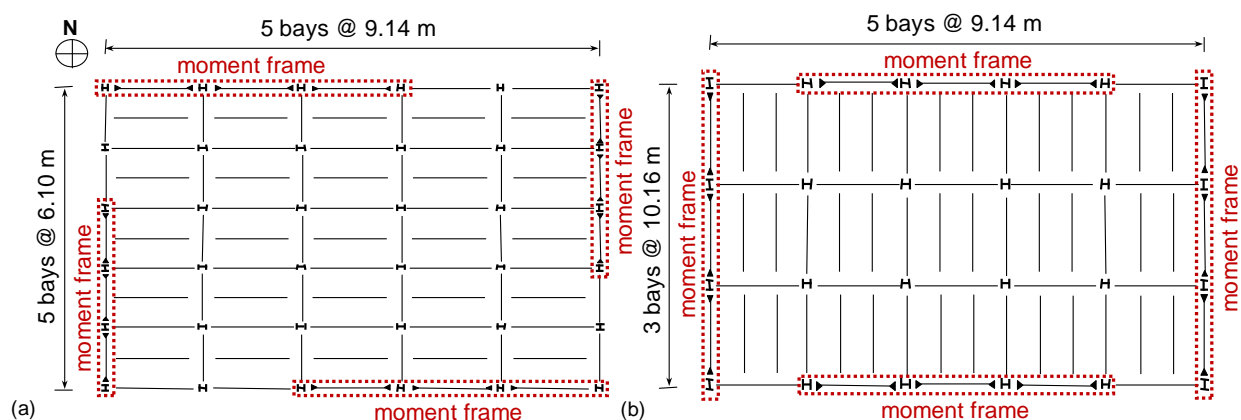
Plan layouts for (a) 5 bay \times 5 bay building and (b) 5 bay \times 3 bay building.
